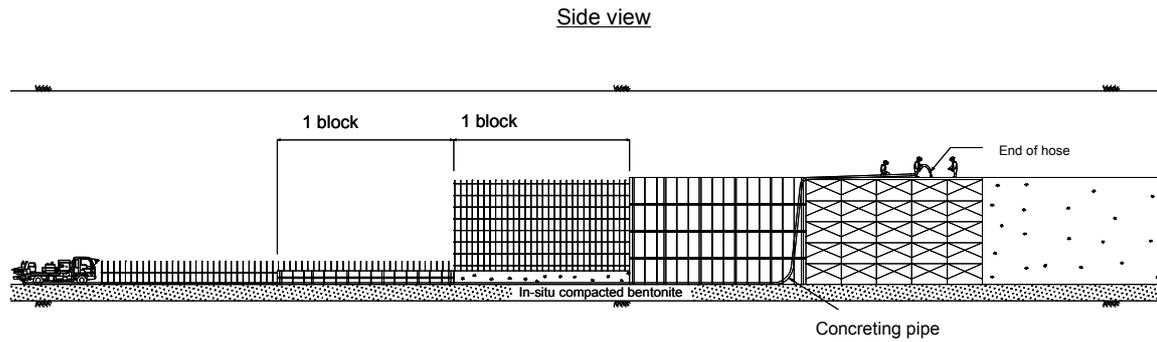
Construction of reinforced concrete structural framework
